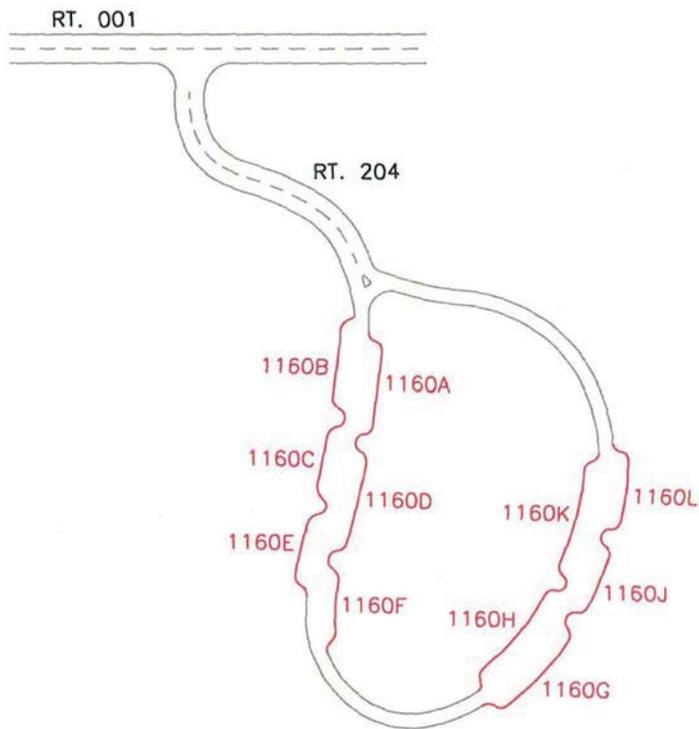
Parking with access route 204 and multiple parking areas (1160 A-L). Currently, this parking area is 12 routes and 12 assets (one 1100 asset and 11 1300 assets).
